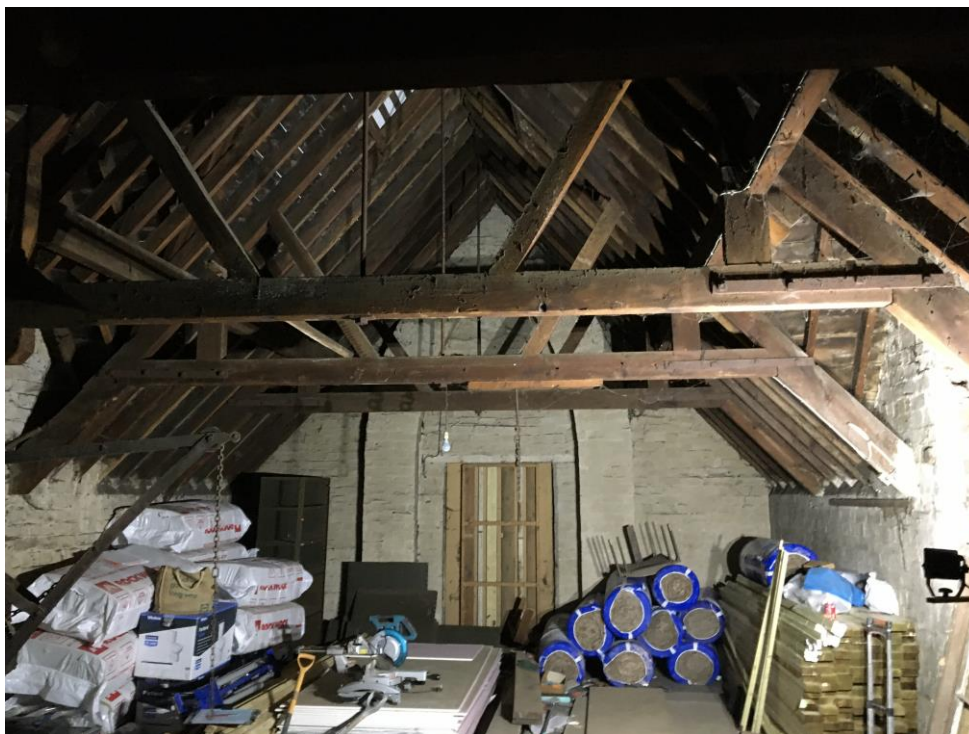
View N showing central and northern bays of main compartment on first floor with queen-post roof trusses above
